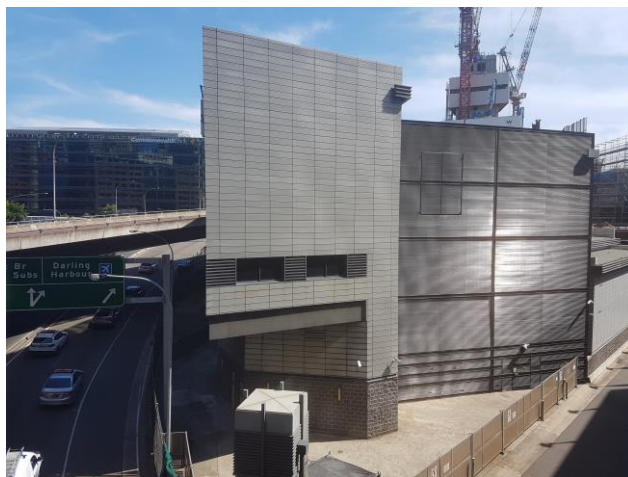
Ausgrid Substation building, located to the east of Harbour Street
